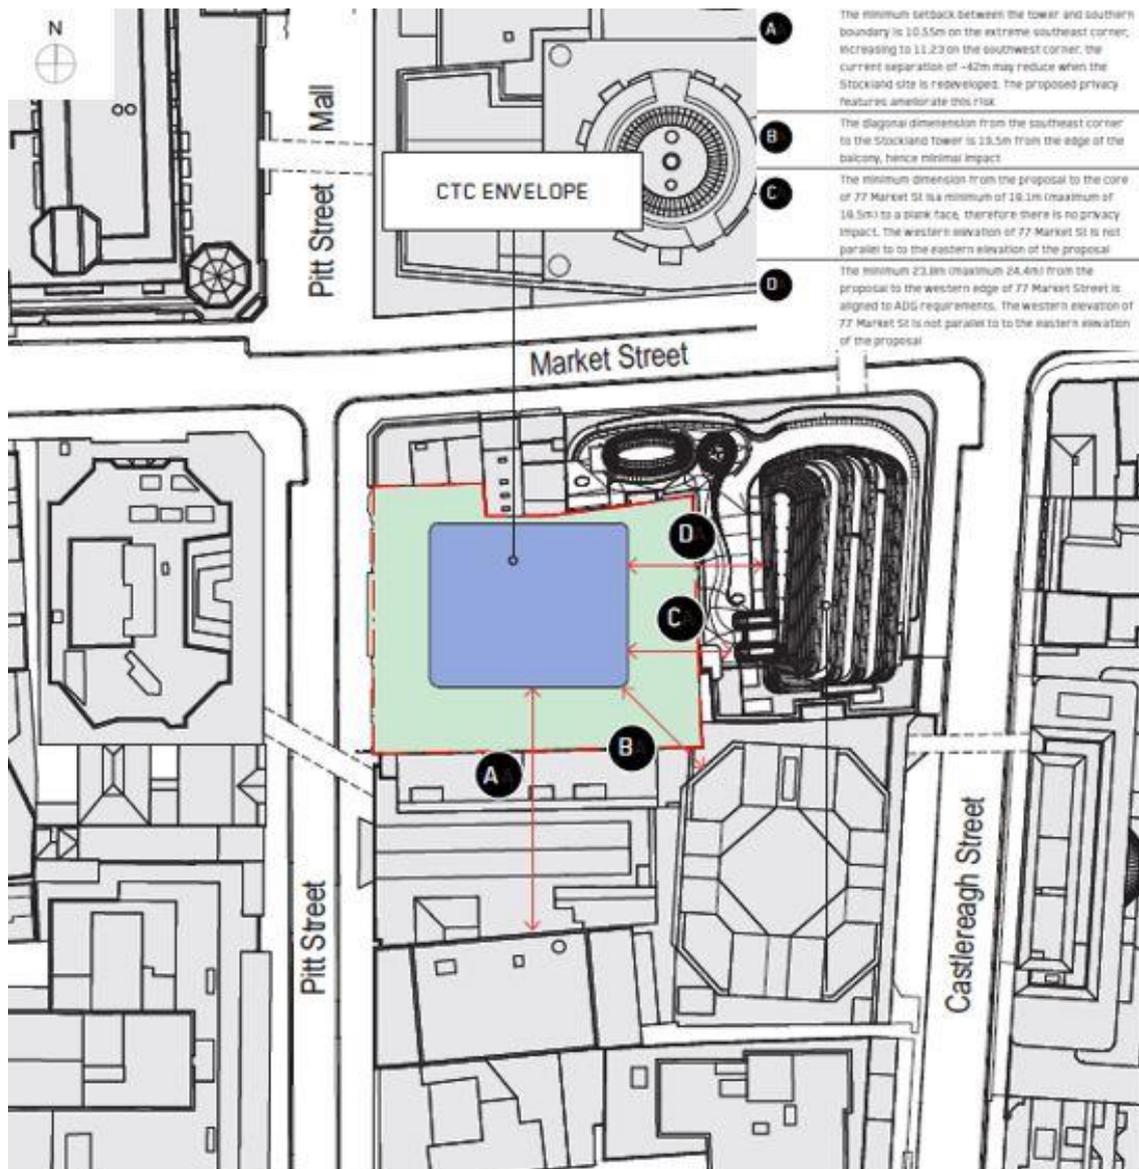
Site plan extract demonstrating separation distances between the proposed tower (in blue) and surrounding development to the south and east
